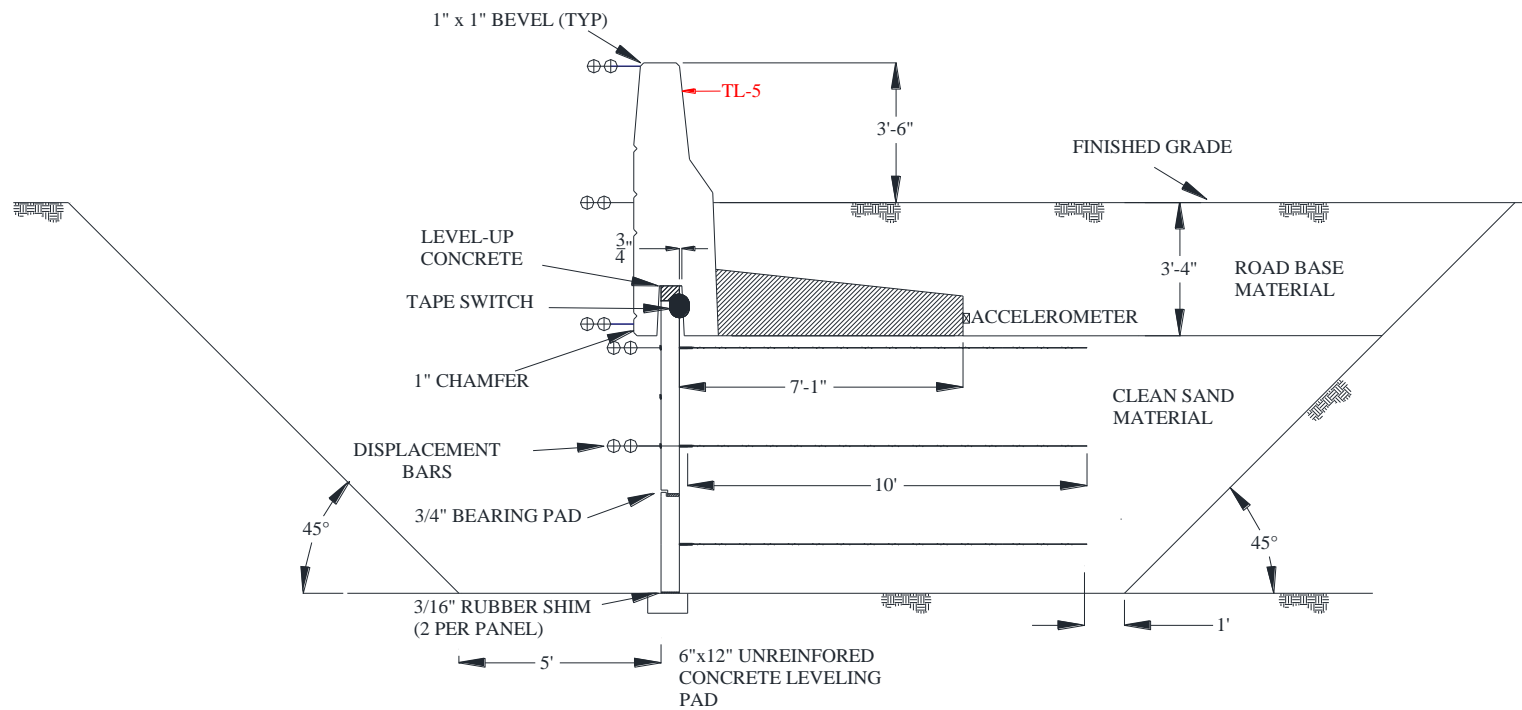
Side view of the TL-5 full-scale test installation (cross section A)
